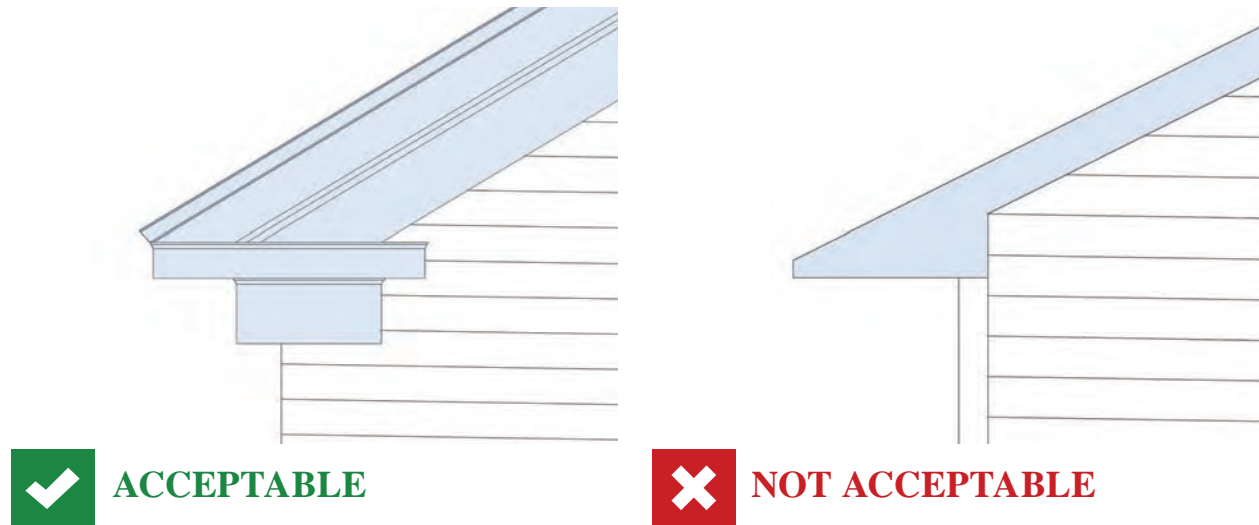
Acceptable and Not Acceptable Eave Brackets
